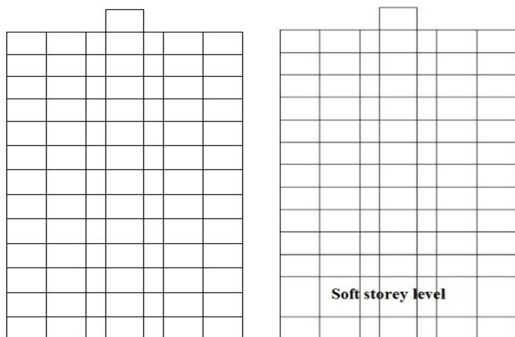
Elevation of (M-1). Figure 4 Elevation of (M-2).
